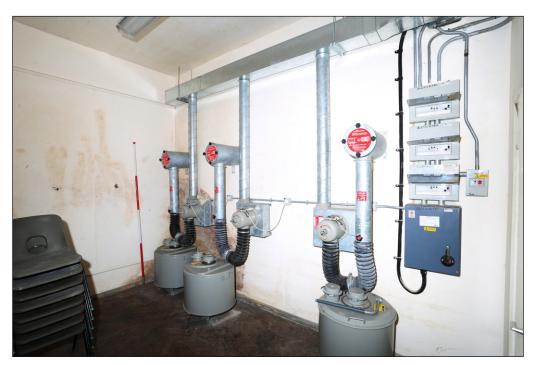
Air Ventilation plant room G showing modern circulation pumps
